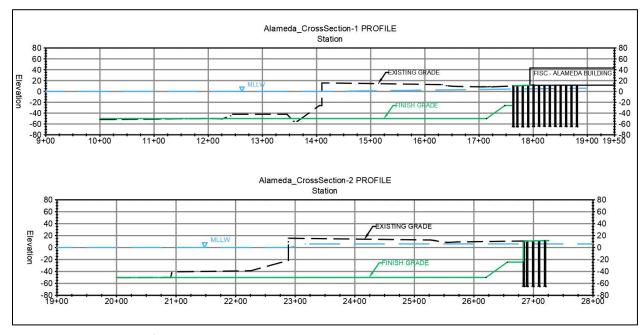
Alameda Wharf Proposed Design Typical Cross Sections
